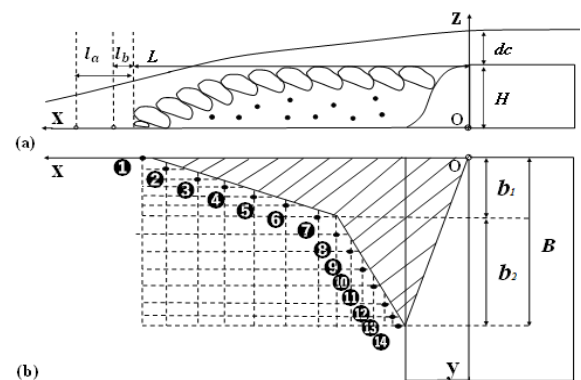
Definition sketch of installation of Ogee weir (a)Side view (b)Plane view
